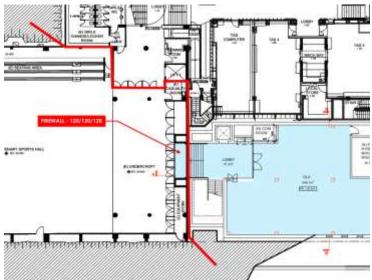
Firewall location which separates the Wilkson Building from the Centenary Sports Hall
